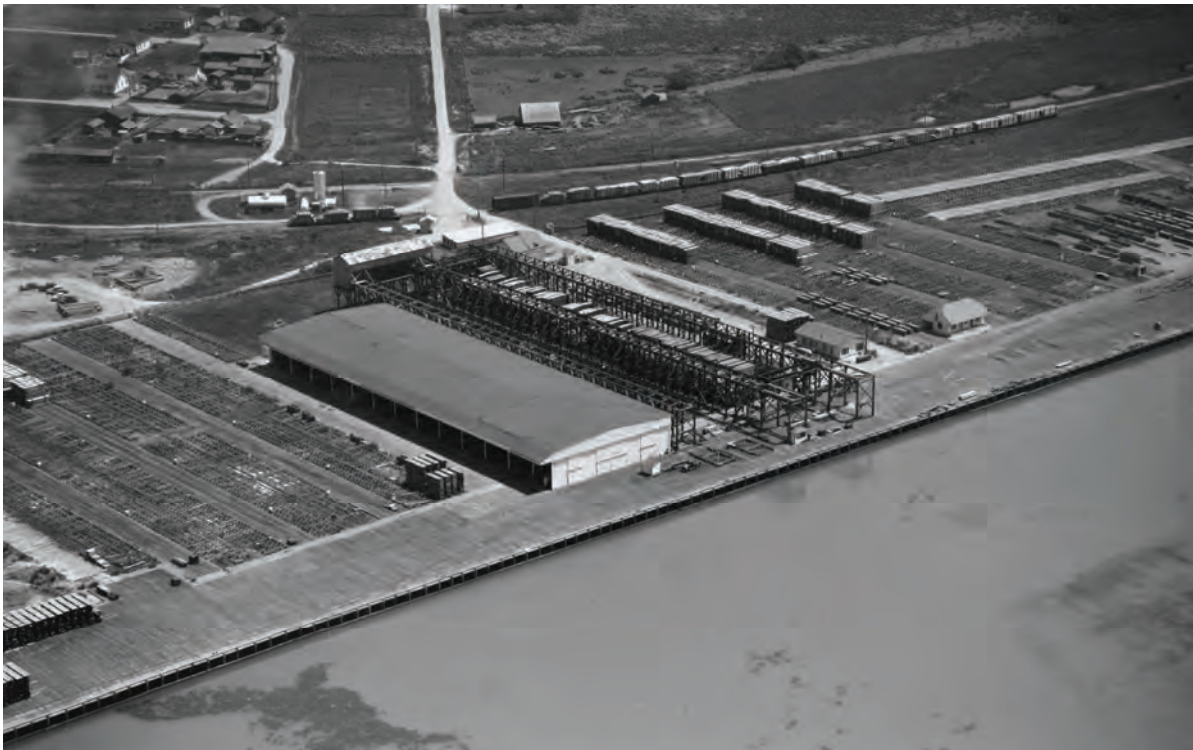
1947 aerial photo showing former Kramer Dock and supporting piles (Humboldt Room 1947).
